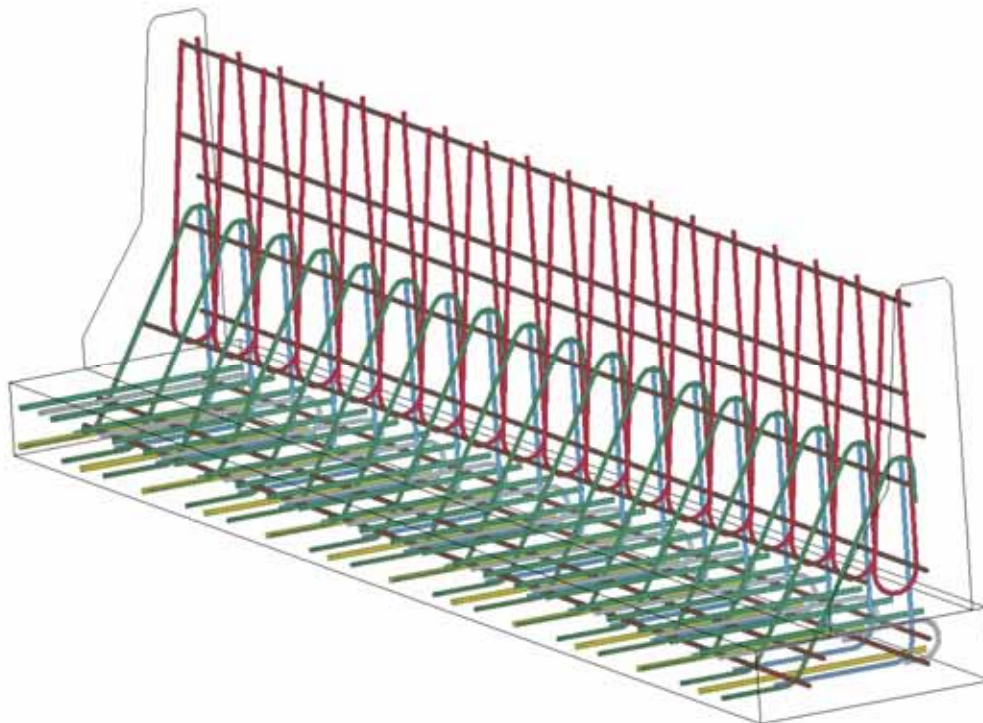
Isometric view of steel reinforcement in Florida barrier model.
